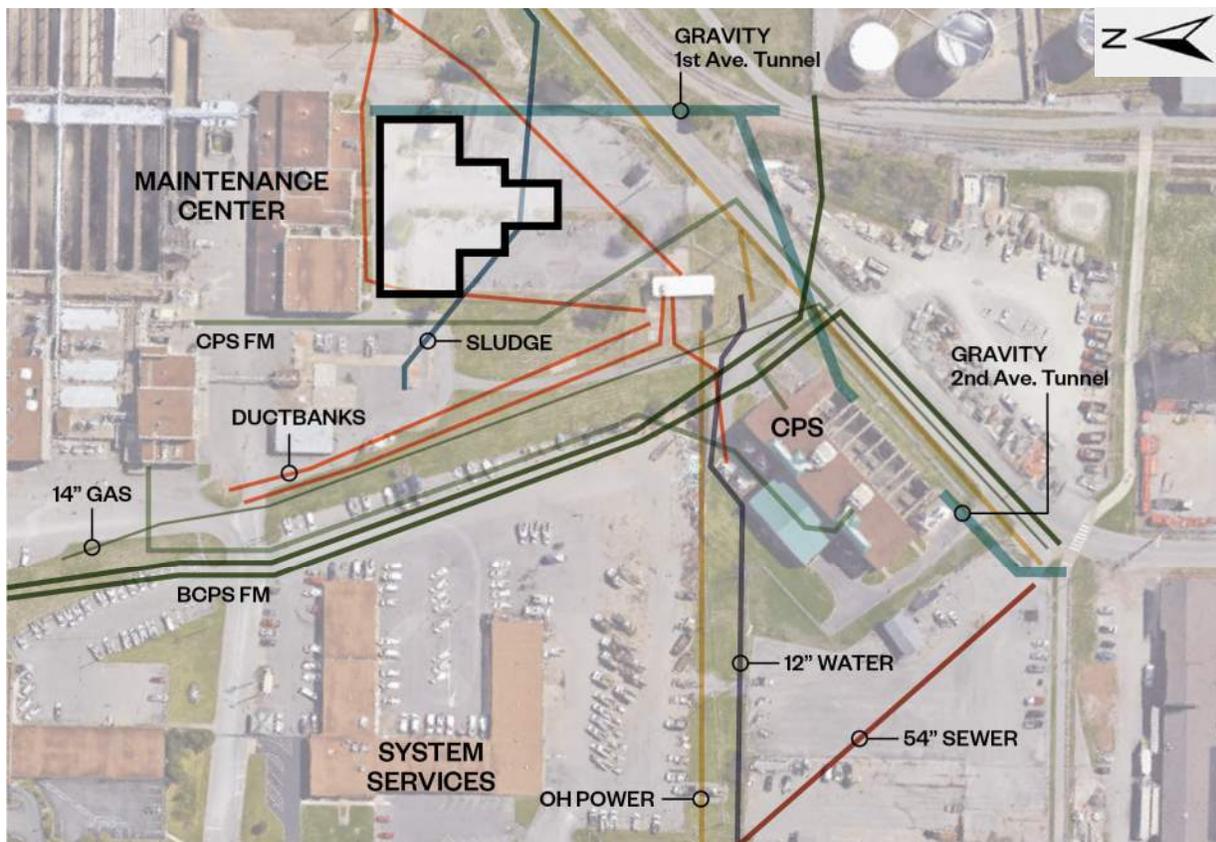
Site Layout for Headworks Location Alternative No. 1
